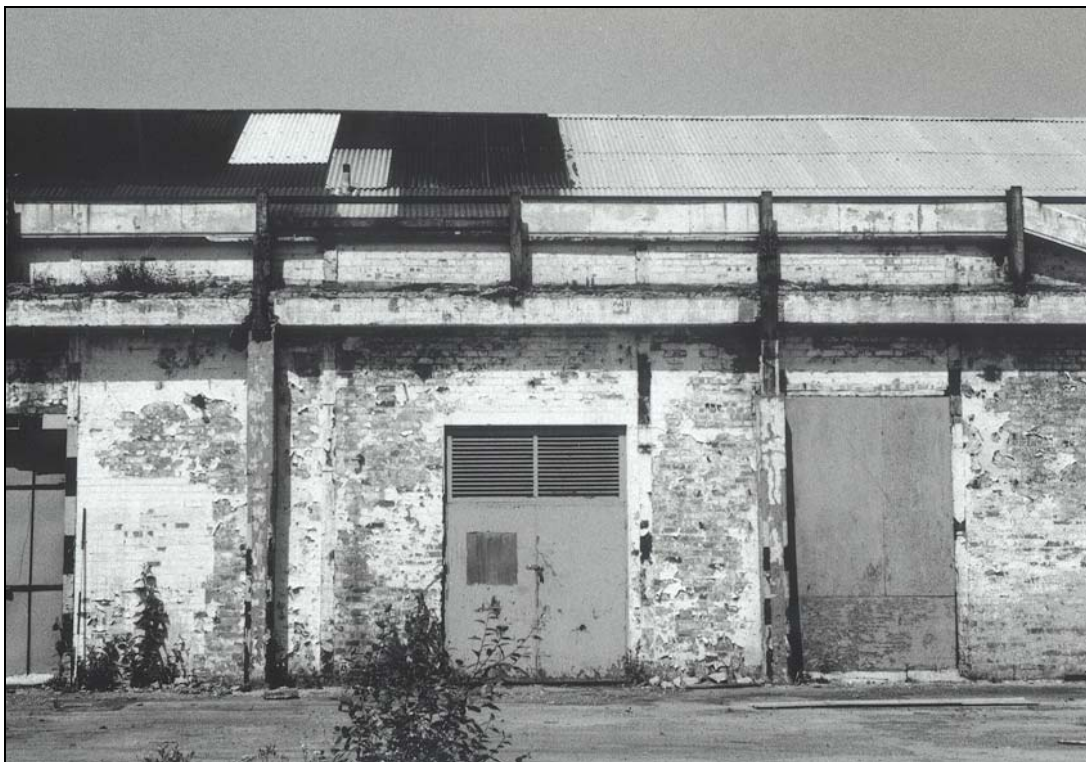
South elevation of engine room, formerly internal elevation within foundry.
